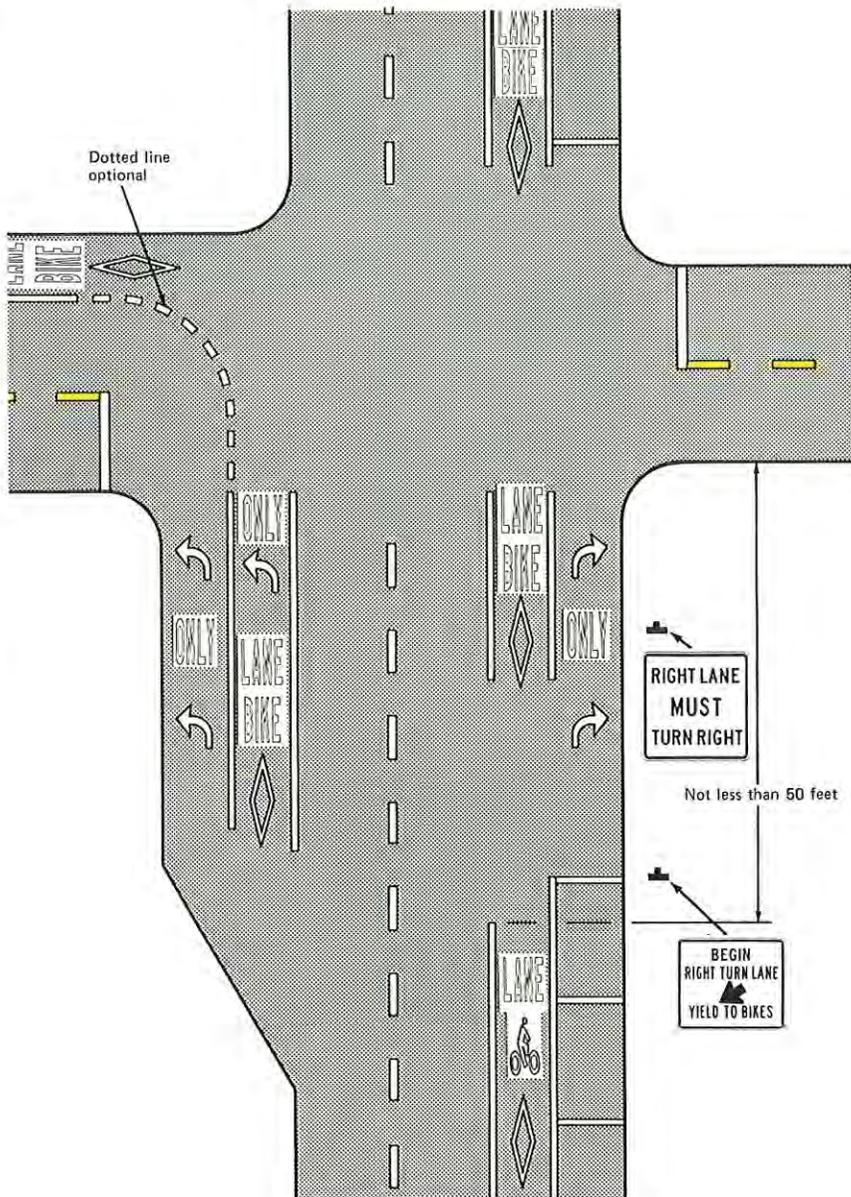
Intersection pavement markings—designated bicycle lane with left turn area, heavy turn volumes, parking, one-way traffic or divided roadway.
